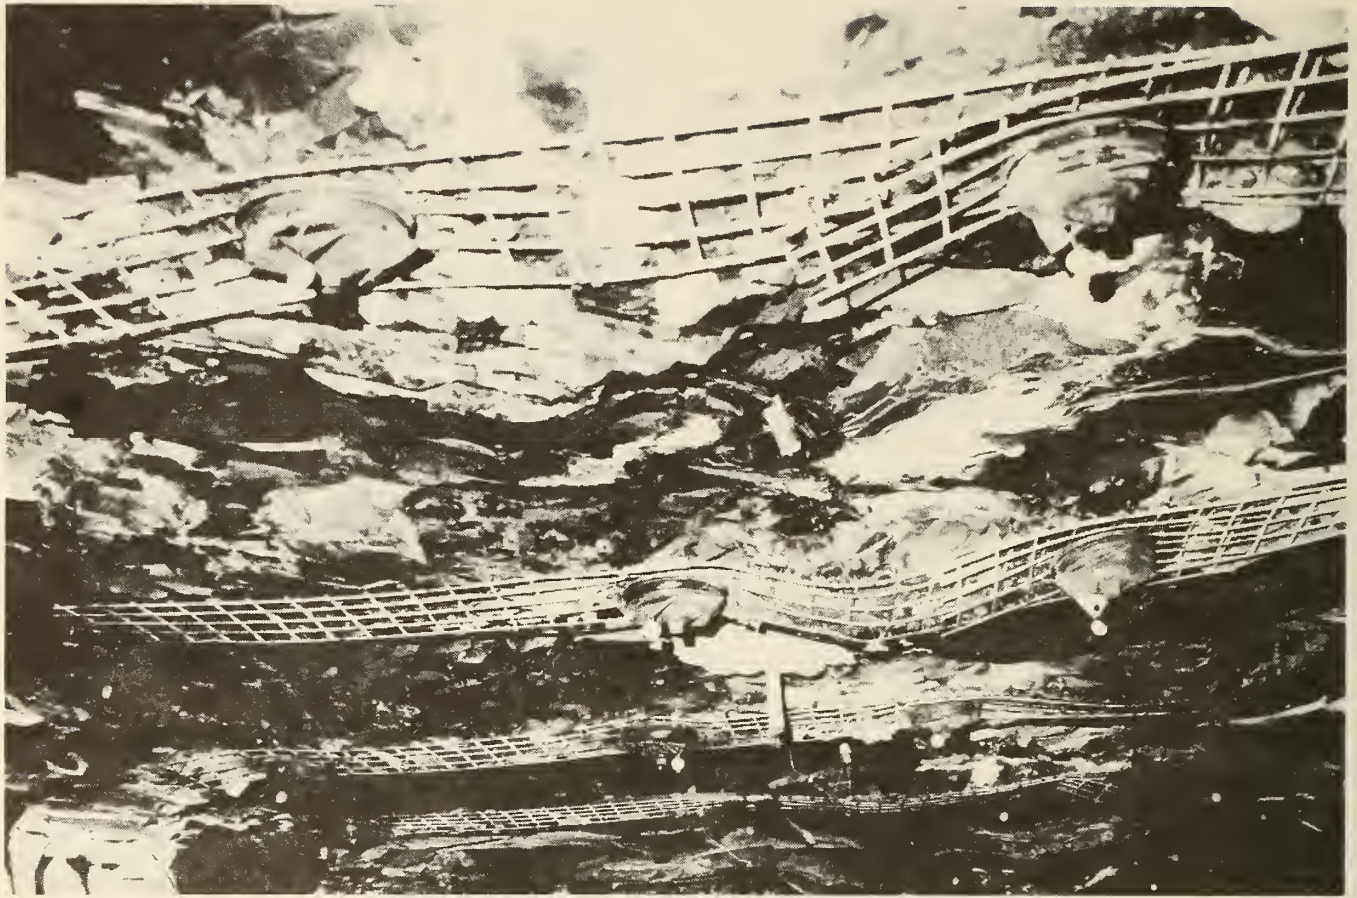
Roof spalling in Roadside Mine test site.
